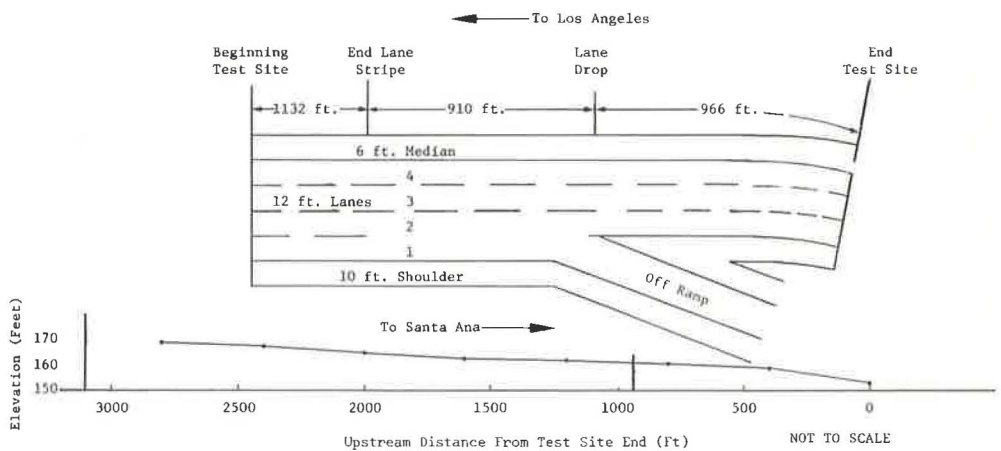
Plan and elevation view of site 3 on Santa Ana Freeway at Triggs Street.
